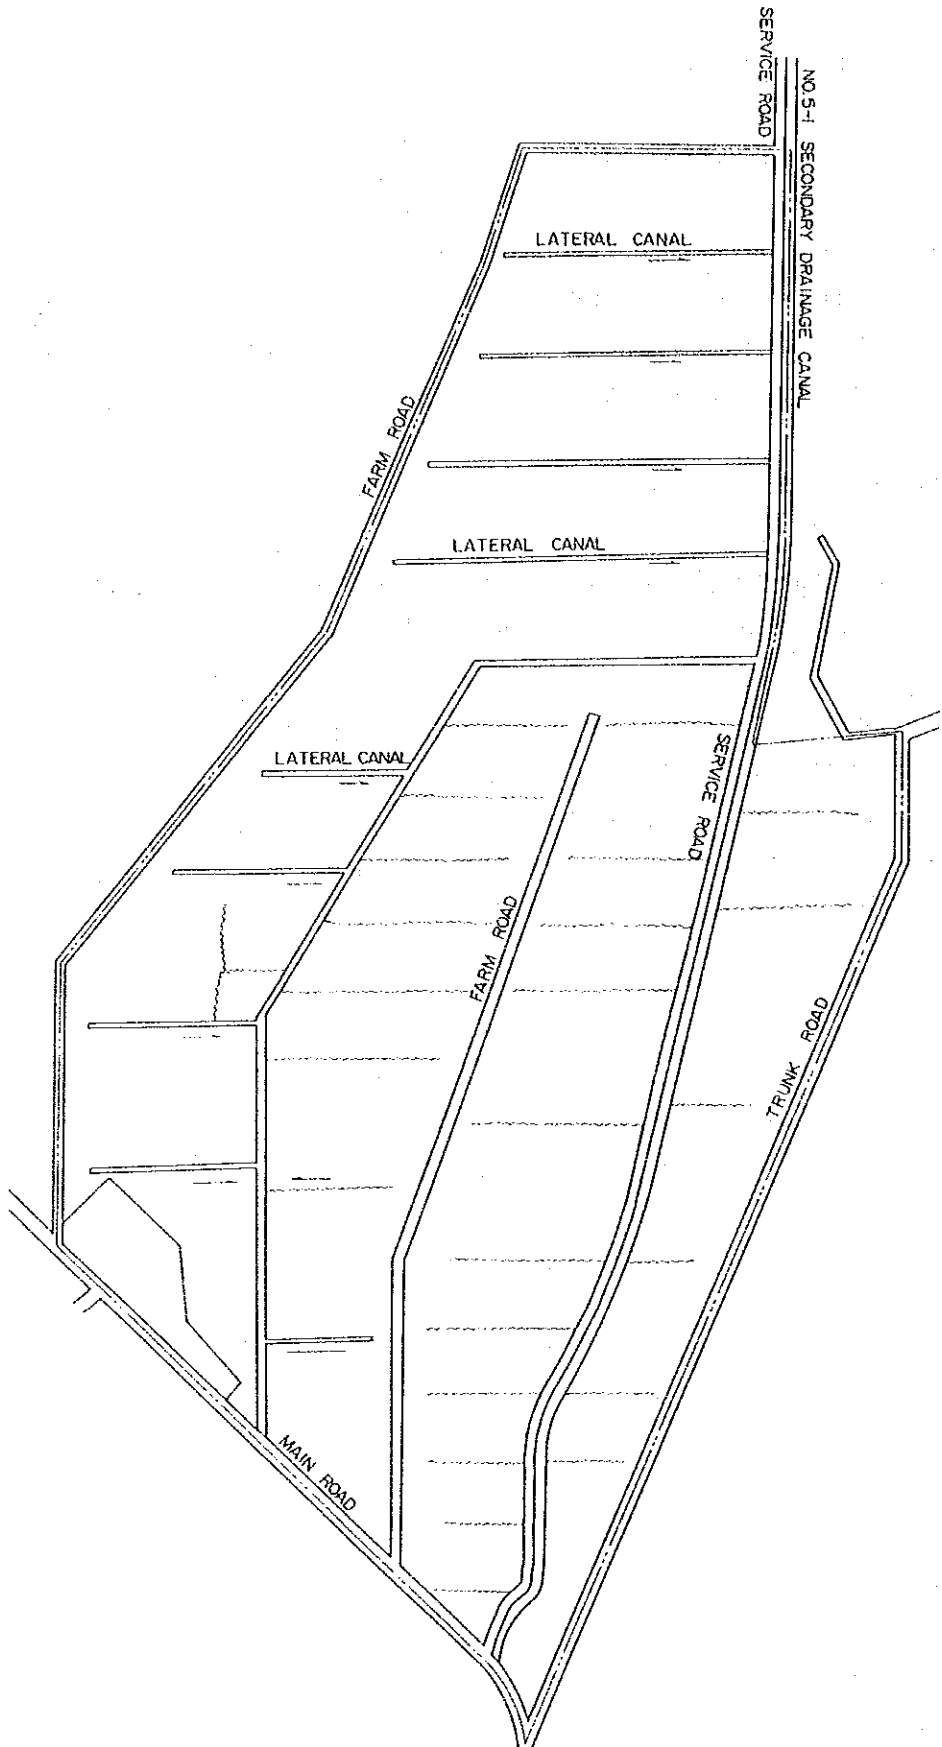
(1) Land Consolidation Plan - Sara Area
